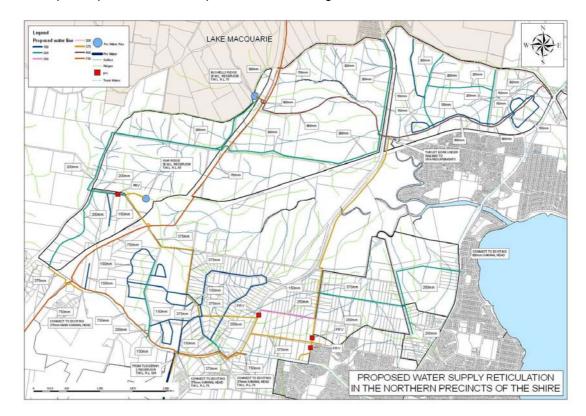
Proposed Reticulation Plan of Northern Precincts by WSC
